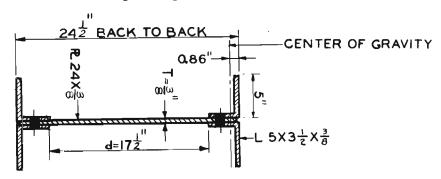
Cross section through riveted plate girder equivalent to 21-inch 63-pound rolled beam.
